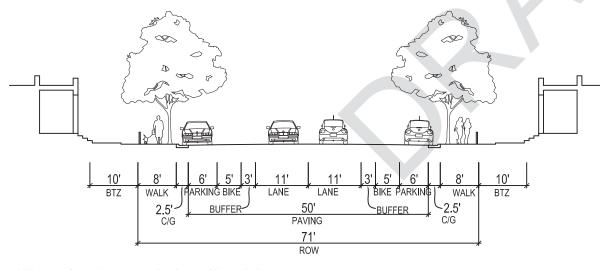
Street Type 4.2: Park Edge Double-Loaded Cross Section
